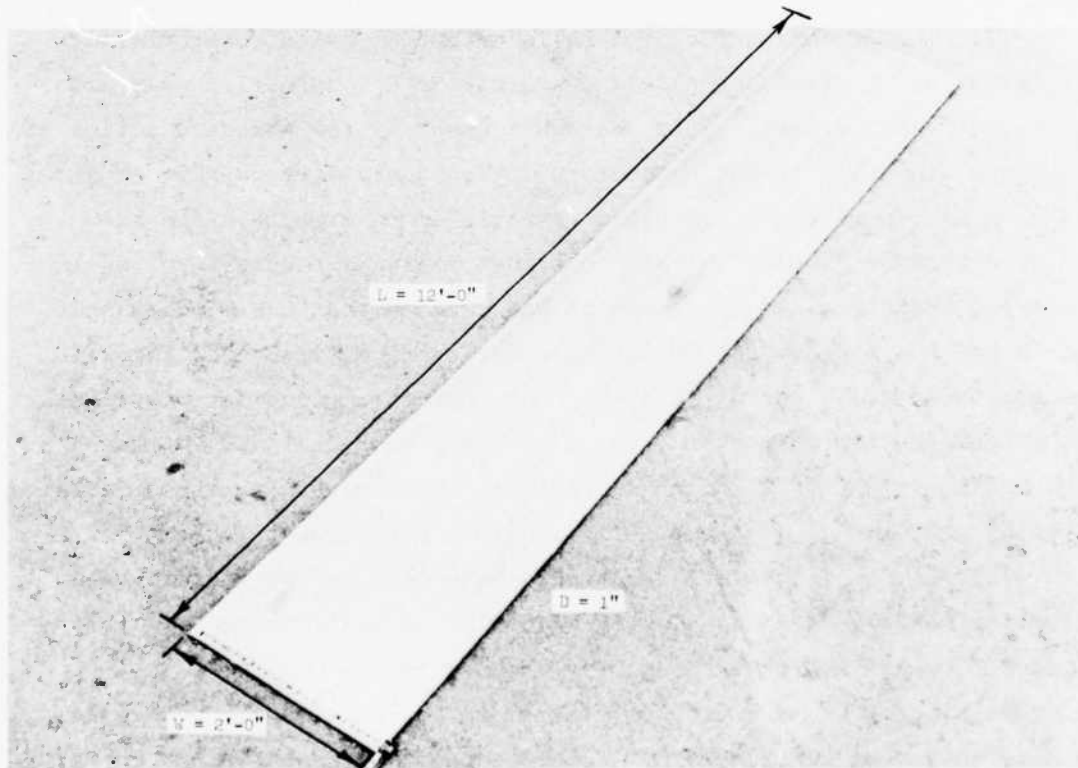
Taber extruded aluminum panel tongue-and-groove connectors, the components of which are integral parts of the panel extrusion. In order to prevent the panels from
